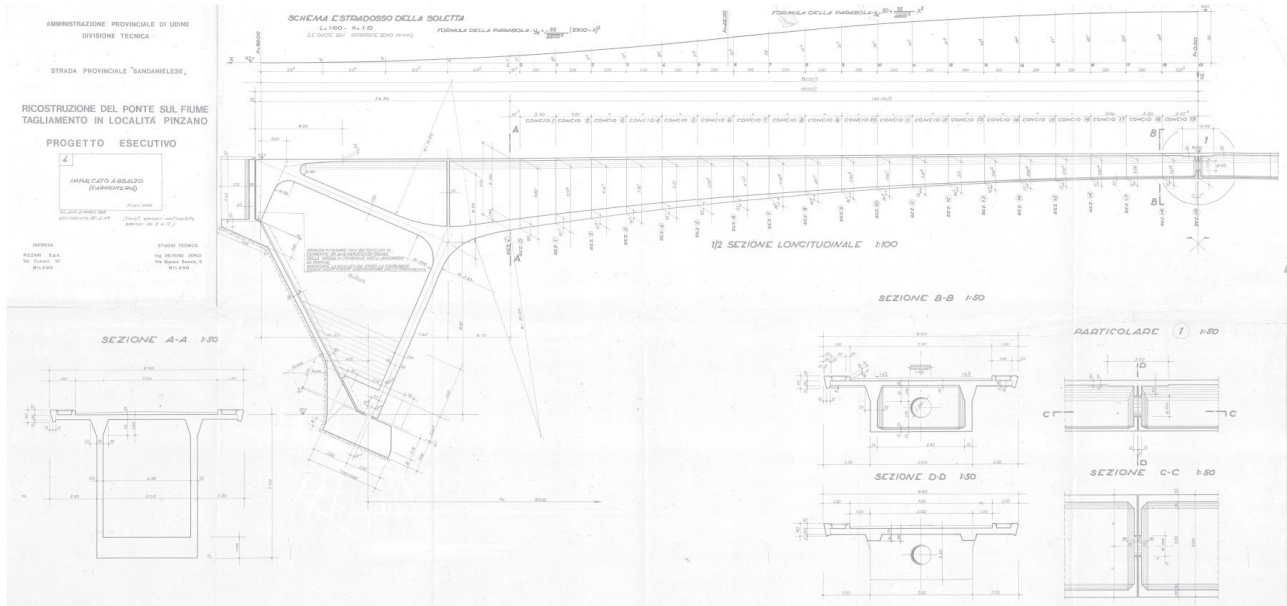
Bridge over the river Tagliamento at Pinzano, working drawings. Cantilever deck, longitudinal section of formwork (In.Co. S.p.A. Historical Archive, Rome).
